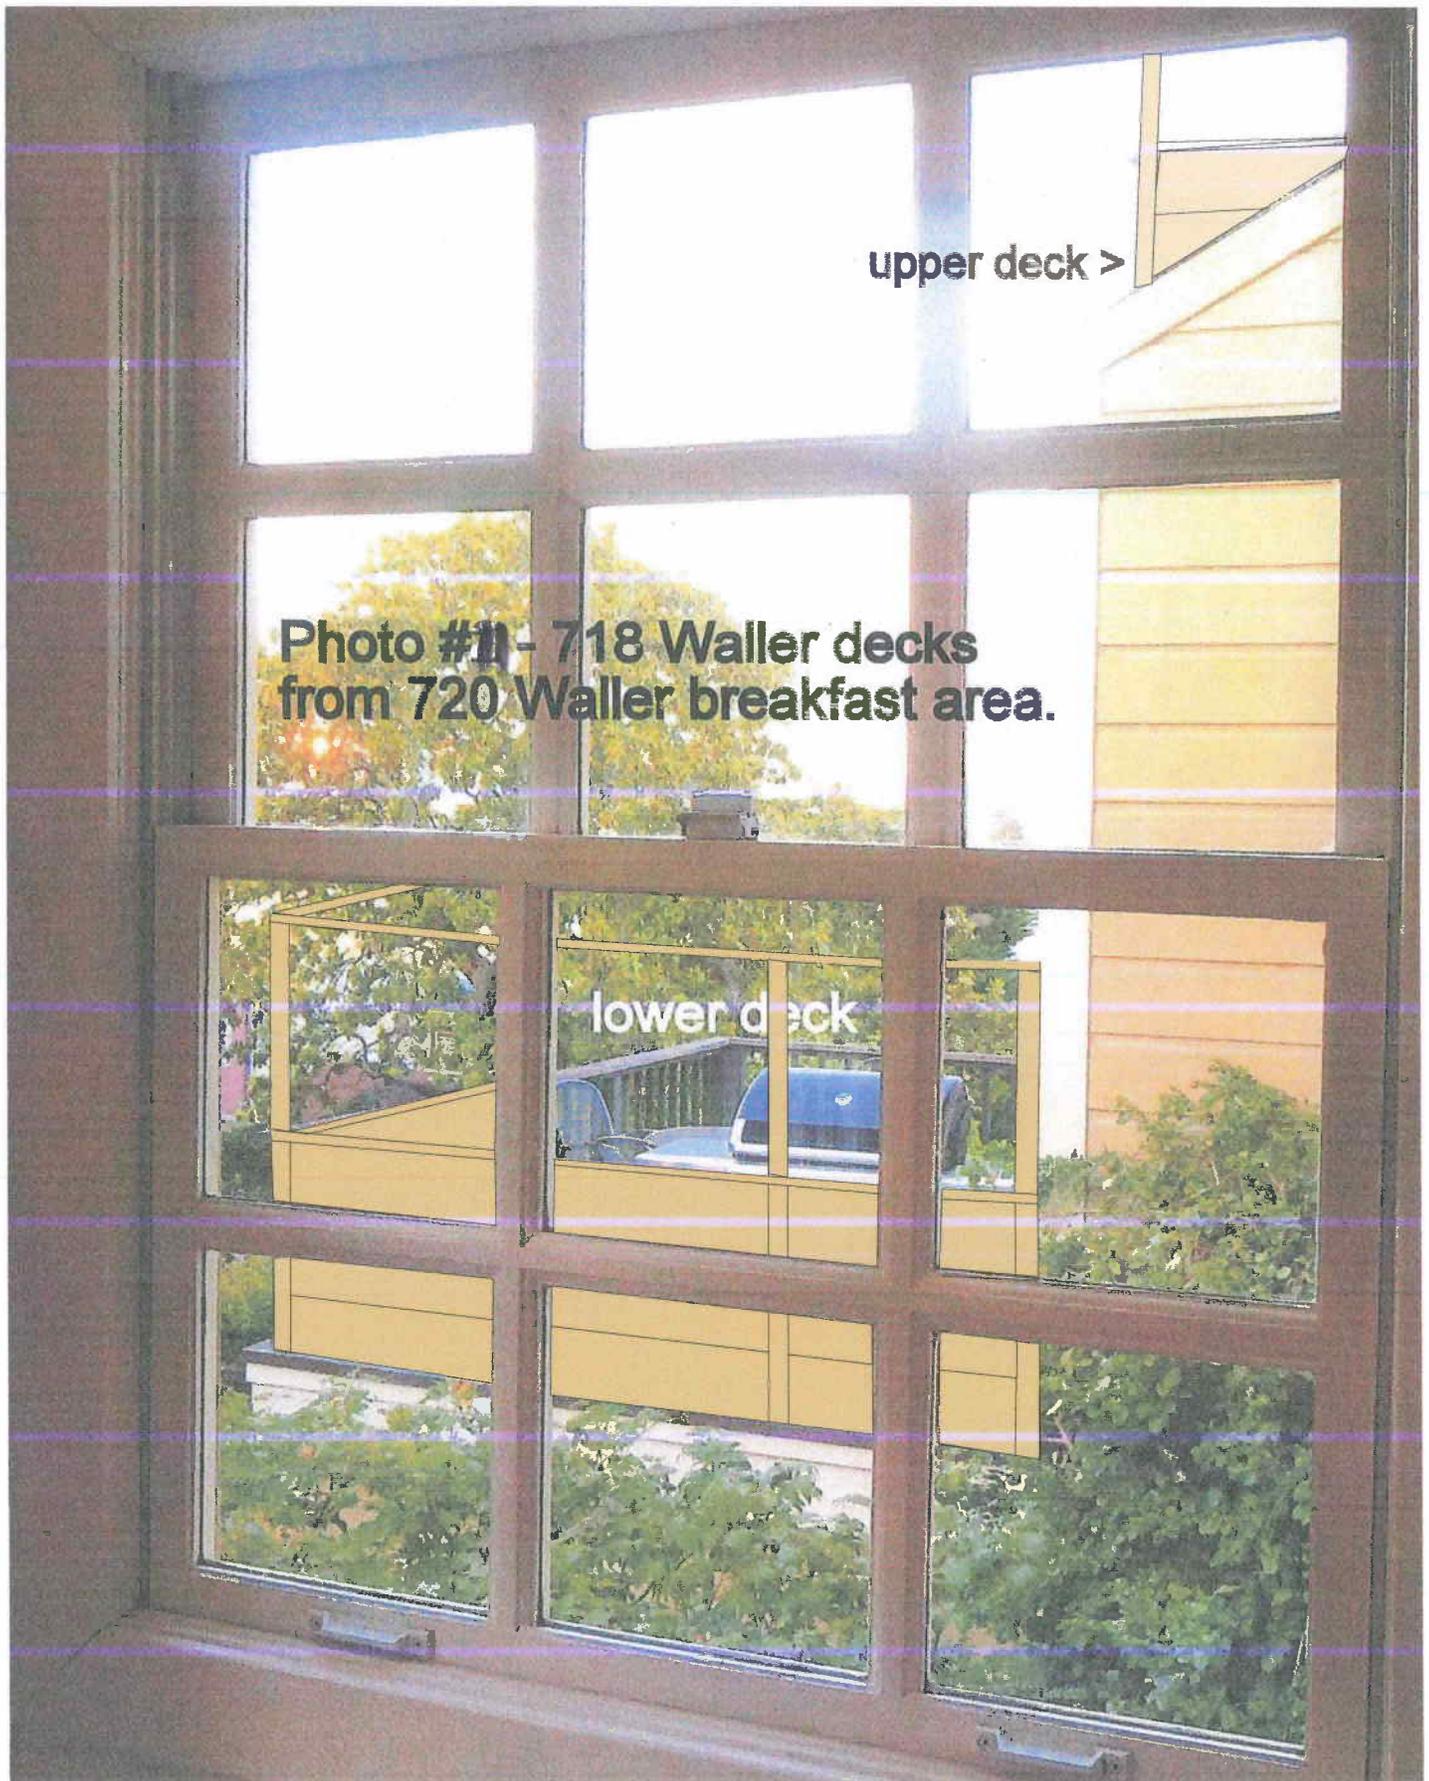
PROPOSED LOW WALL WITH GUSS ABOVE
